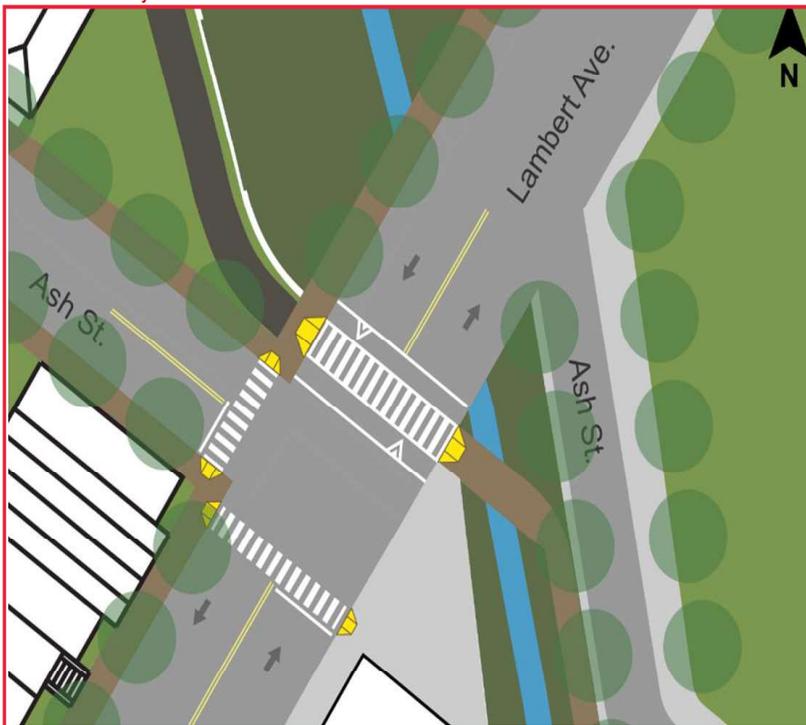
Lambert Avenue and Ash Street Conceptual Intersection Design
